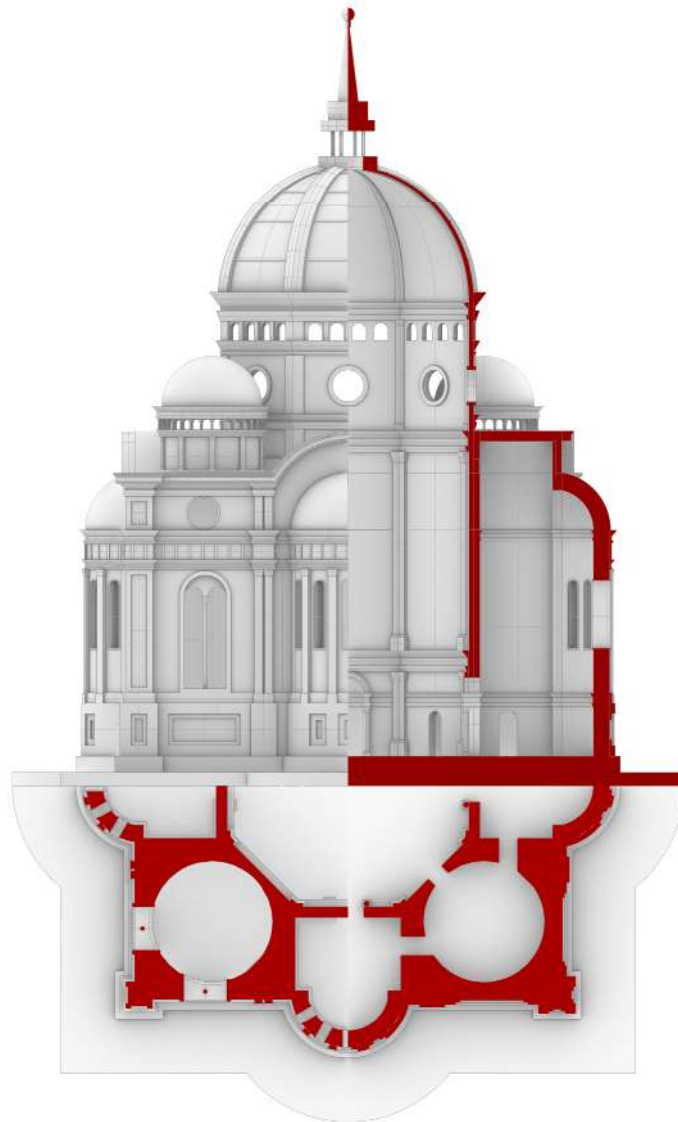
Plan, section and elevation of the variant obtained by the bird's eye view, with a rounded shaped cloister dome (1:500).
